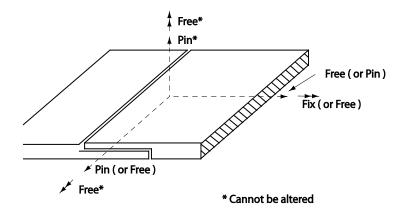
Span Hinge Force Definitions (Priestley et al, 1996)
